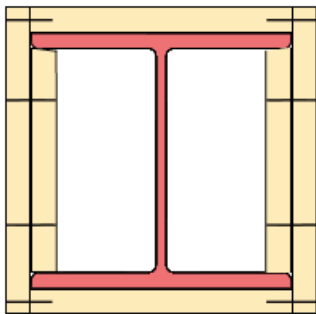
Plan view of Universal Steel Column showing remaining applied Knauf Fireboard
